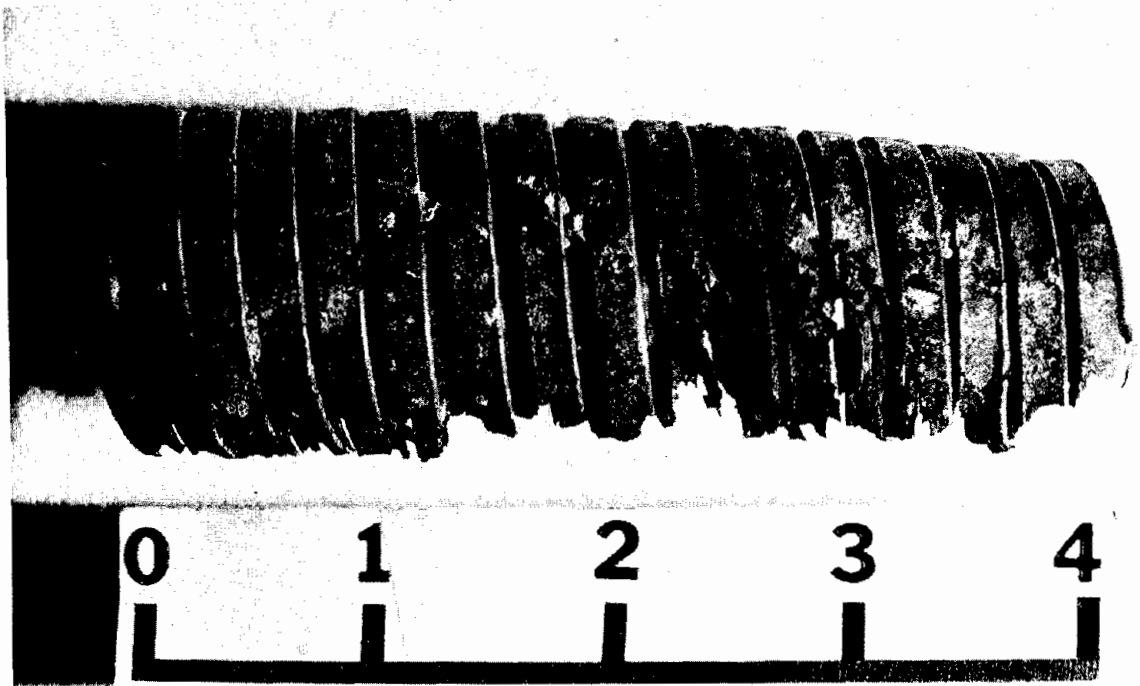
Corrosion of galvanized steel duct from a post-tensioned tee element in a parking structure deck slab. The corrosion zones occurred at the tendon high points in the slab.
